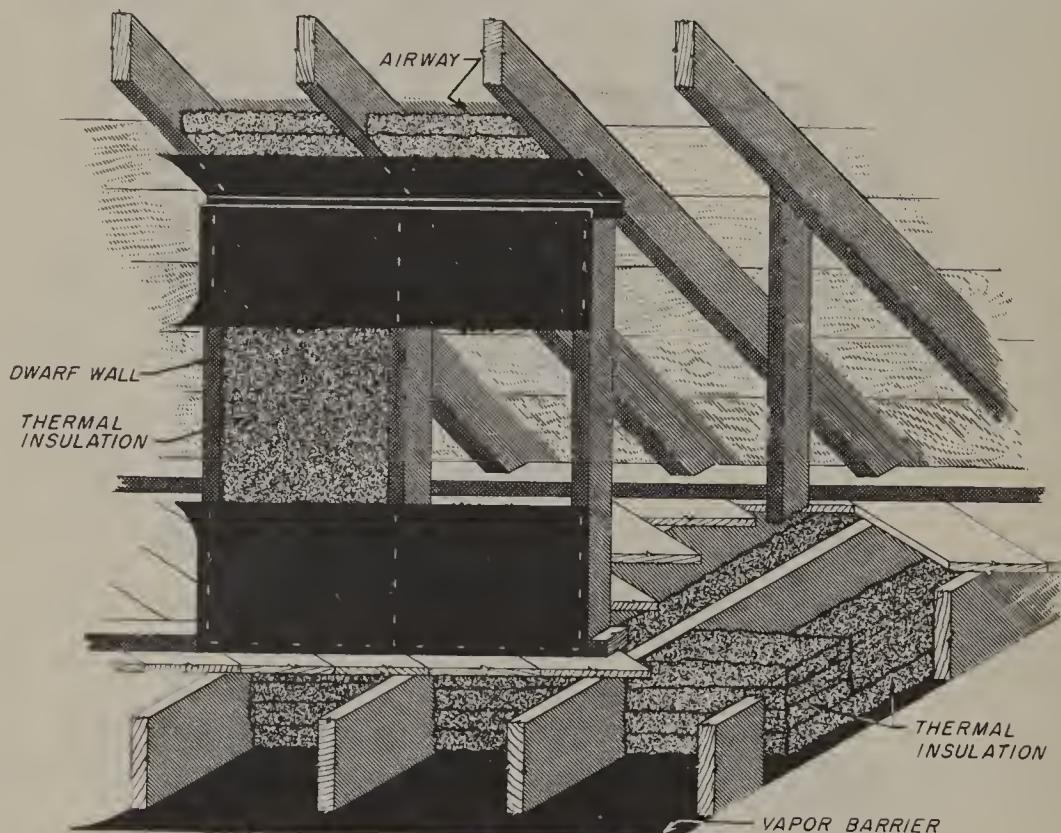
Junction of a dwarf wall with the attic, floor, and roof.
